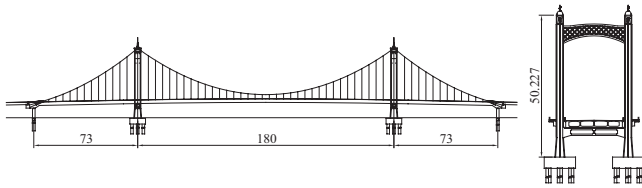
The layout of the main Yellow River Road Bridge in Mainland (unit: m).
